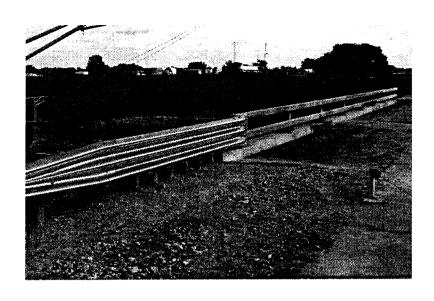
Details of the bridge rail connection of Alaska Multi-State Bridge Rail Thrie-Beam Transition.
